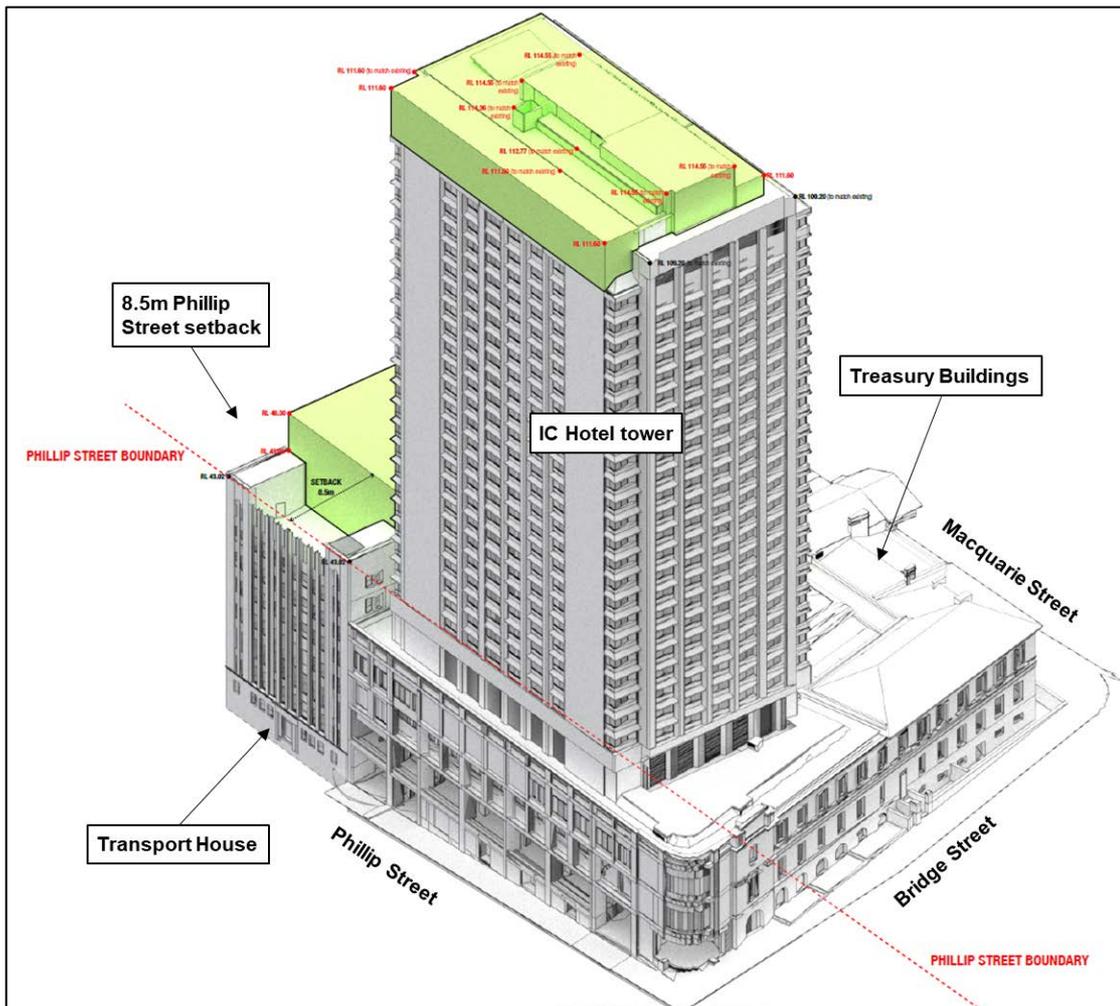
3D perspective of the Phillip Street (western) and Bridge Street (southern) elevations and proposed buildings envelopes and setbacks (Base source: the Applicant’s Amended Concept)
